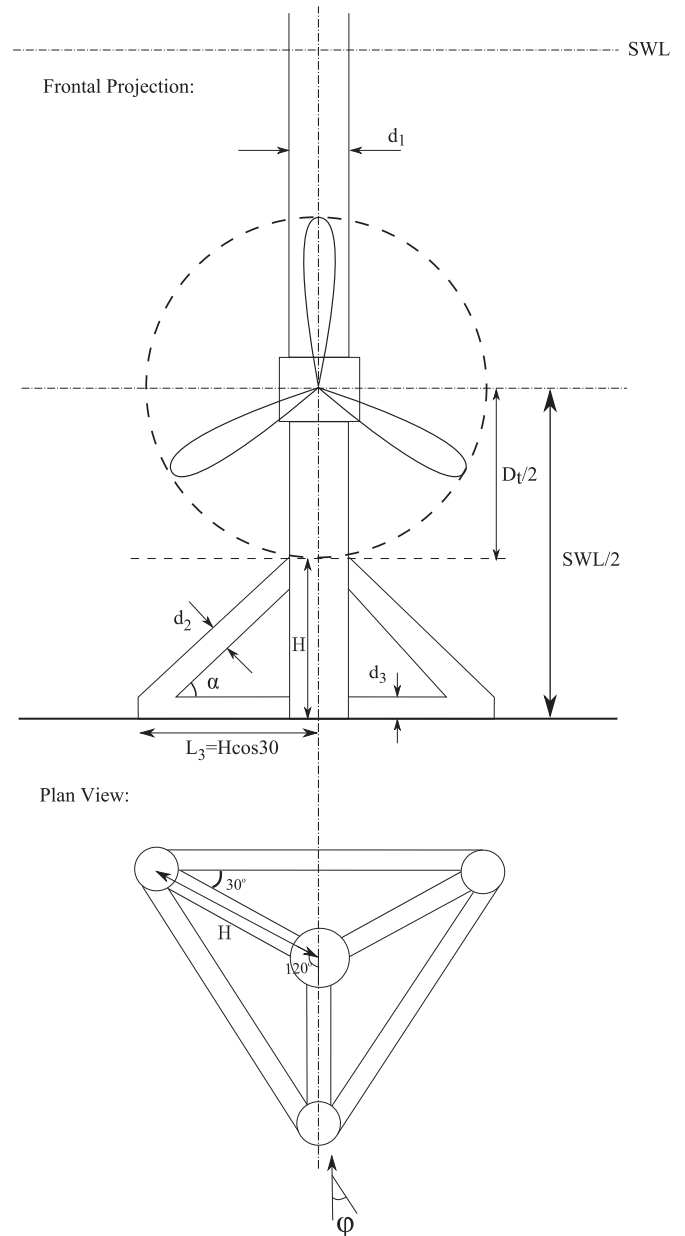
Detailed dimensions of braced section of support structure. Dimensions are quantified in Table 2.
